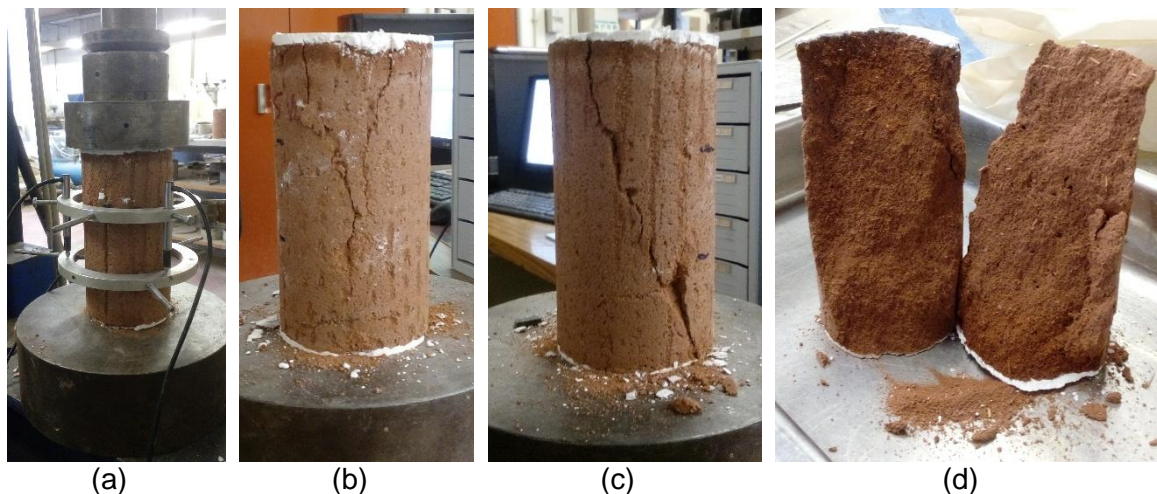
Uniaxial compression test for earth mortar M2 (a) Setting of the specimen in the testing machine; (b); (c) vertical diagonal cracks and (d) separation of the specimen with diagonal crack.
